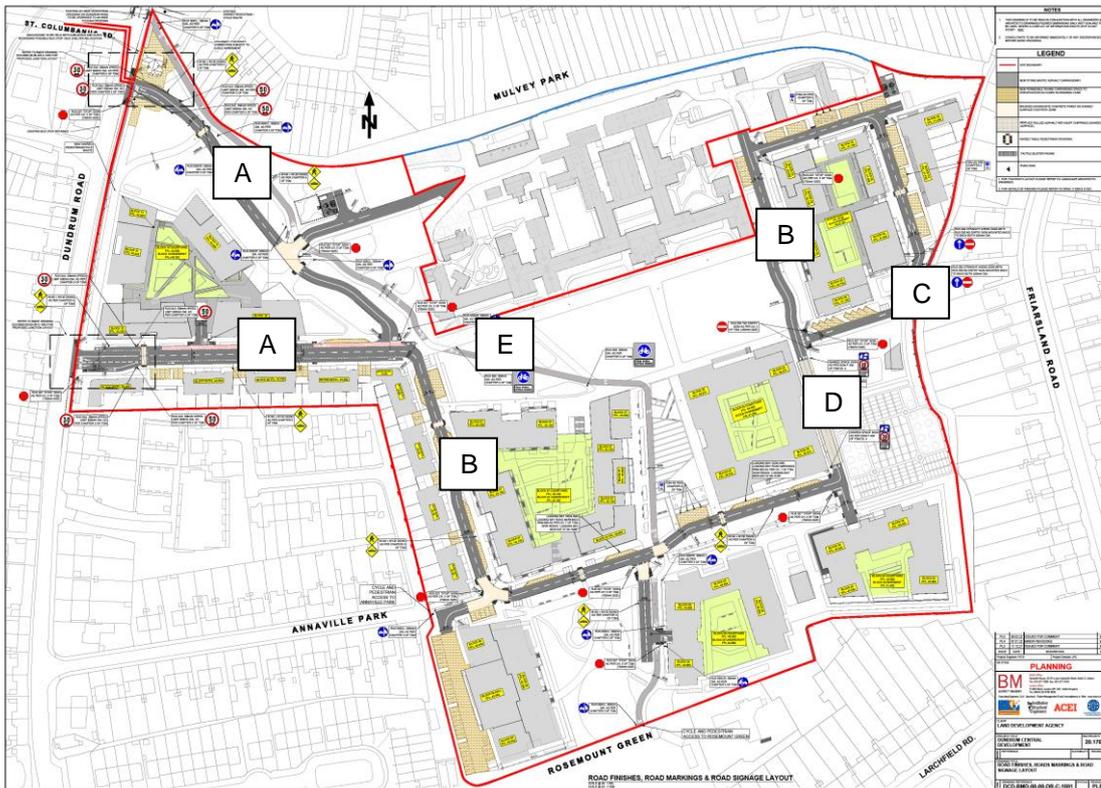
Proposed Road and Street Layout (Source: BMCE)
